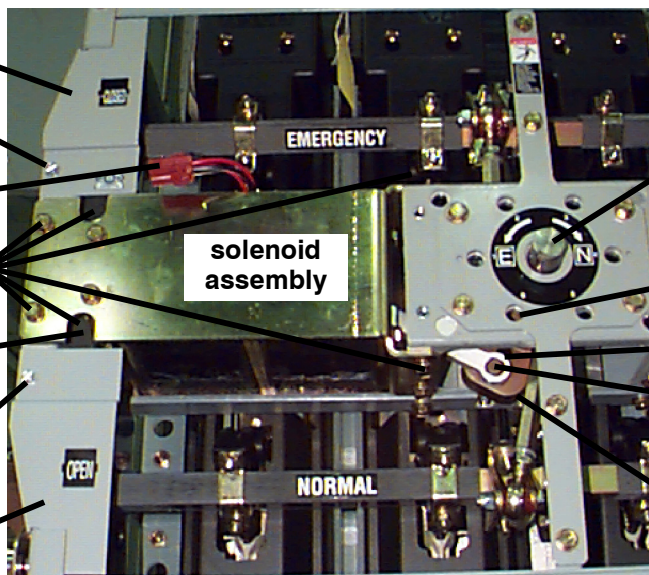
Location of the solenoid assembly and related parts in the drawn-out (removed) transfer switch.
